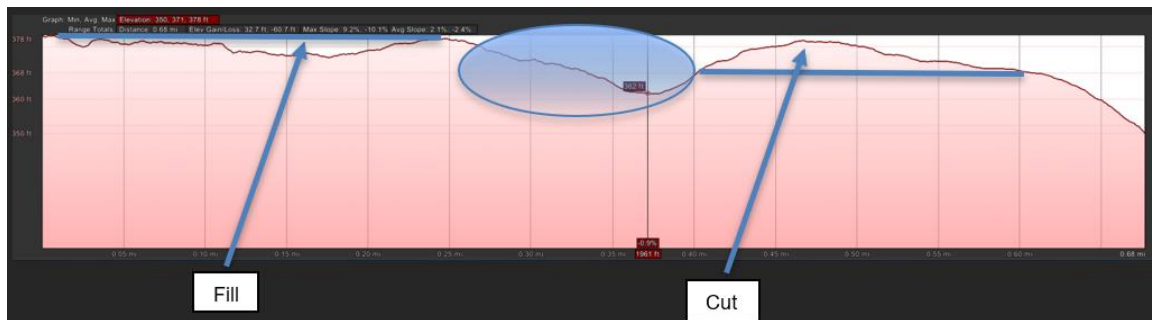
Section 6 Slope Elevation Profile (Source: earth.google.com)
